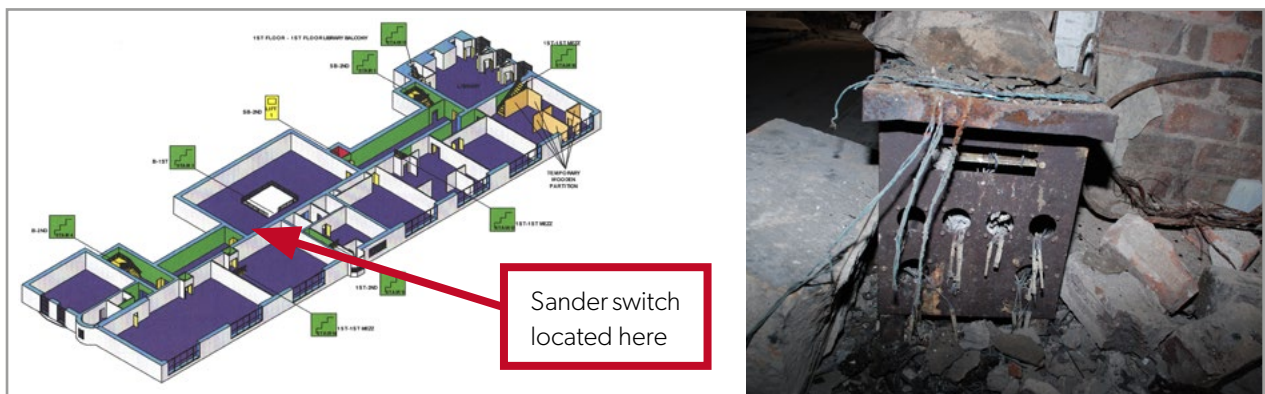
Location of floor sander switch and the remains of one of nine 110volt site transformers
